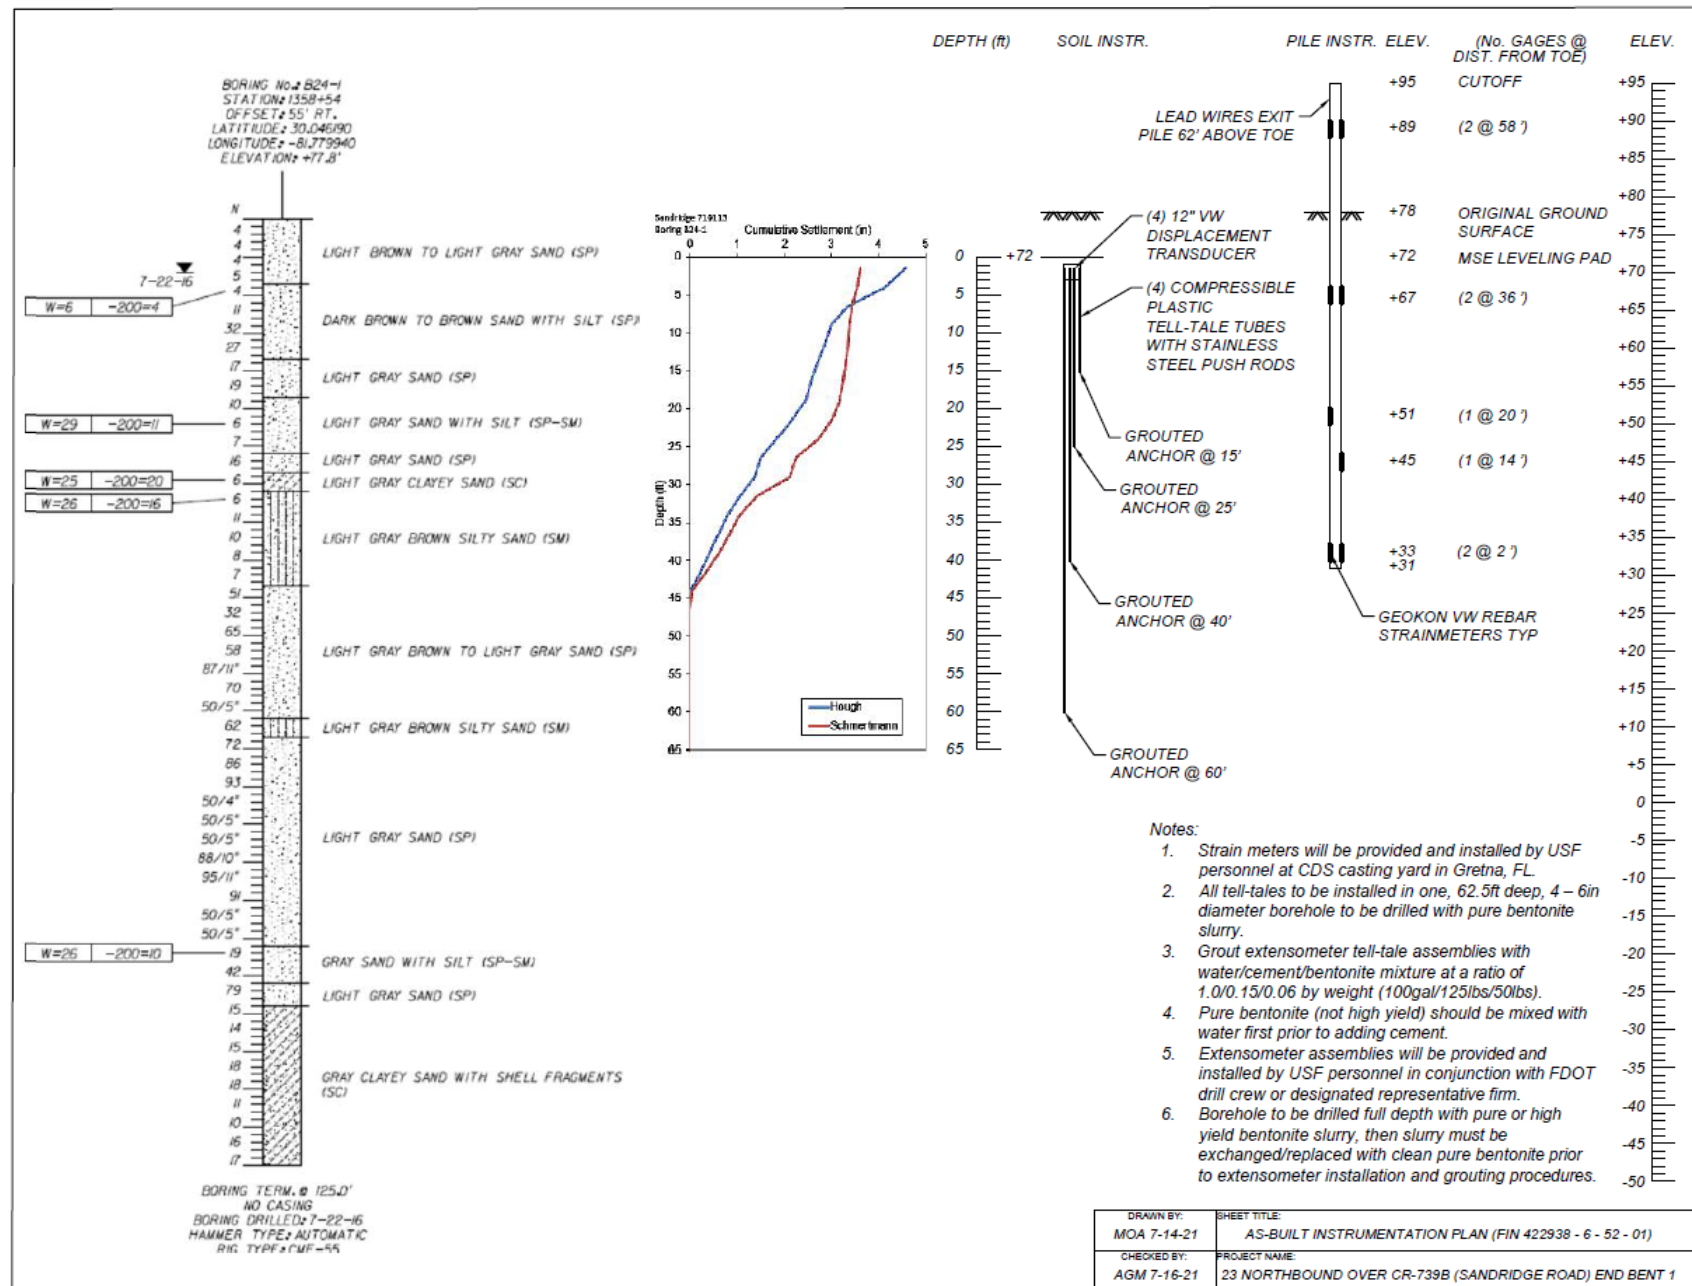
As-built Sandridge Road pile and soil instrumentation scheme
